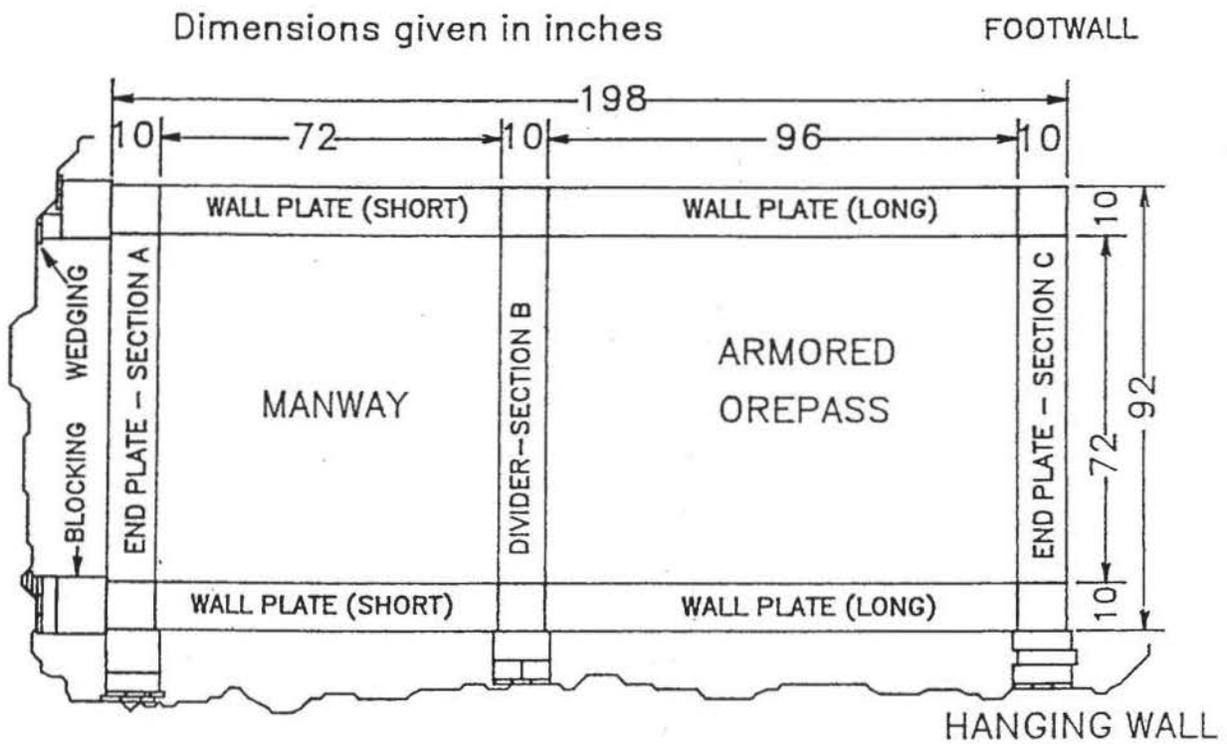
TIMBER FRAME, TOP VIEW
